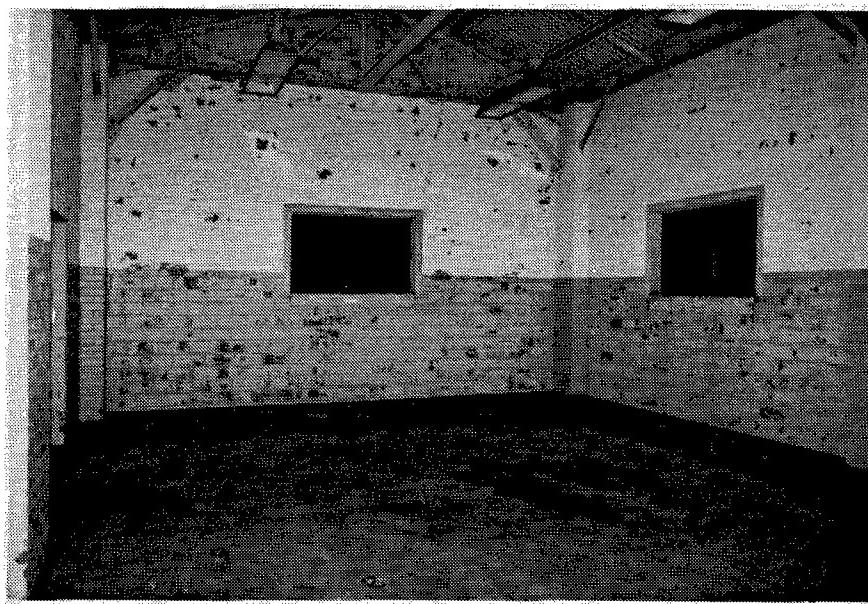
Building CB-11: Interior view of this Fuze Service Building.
